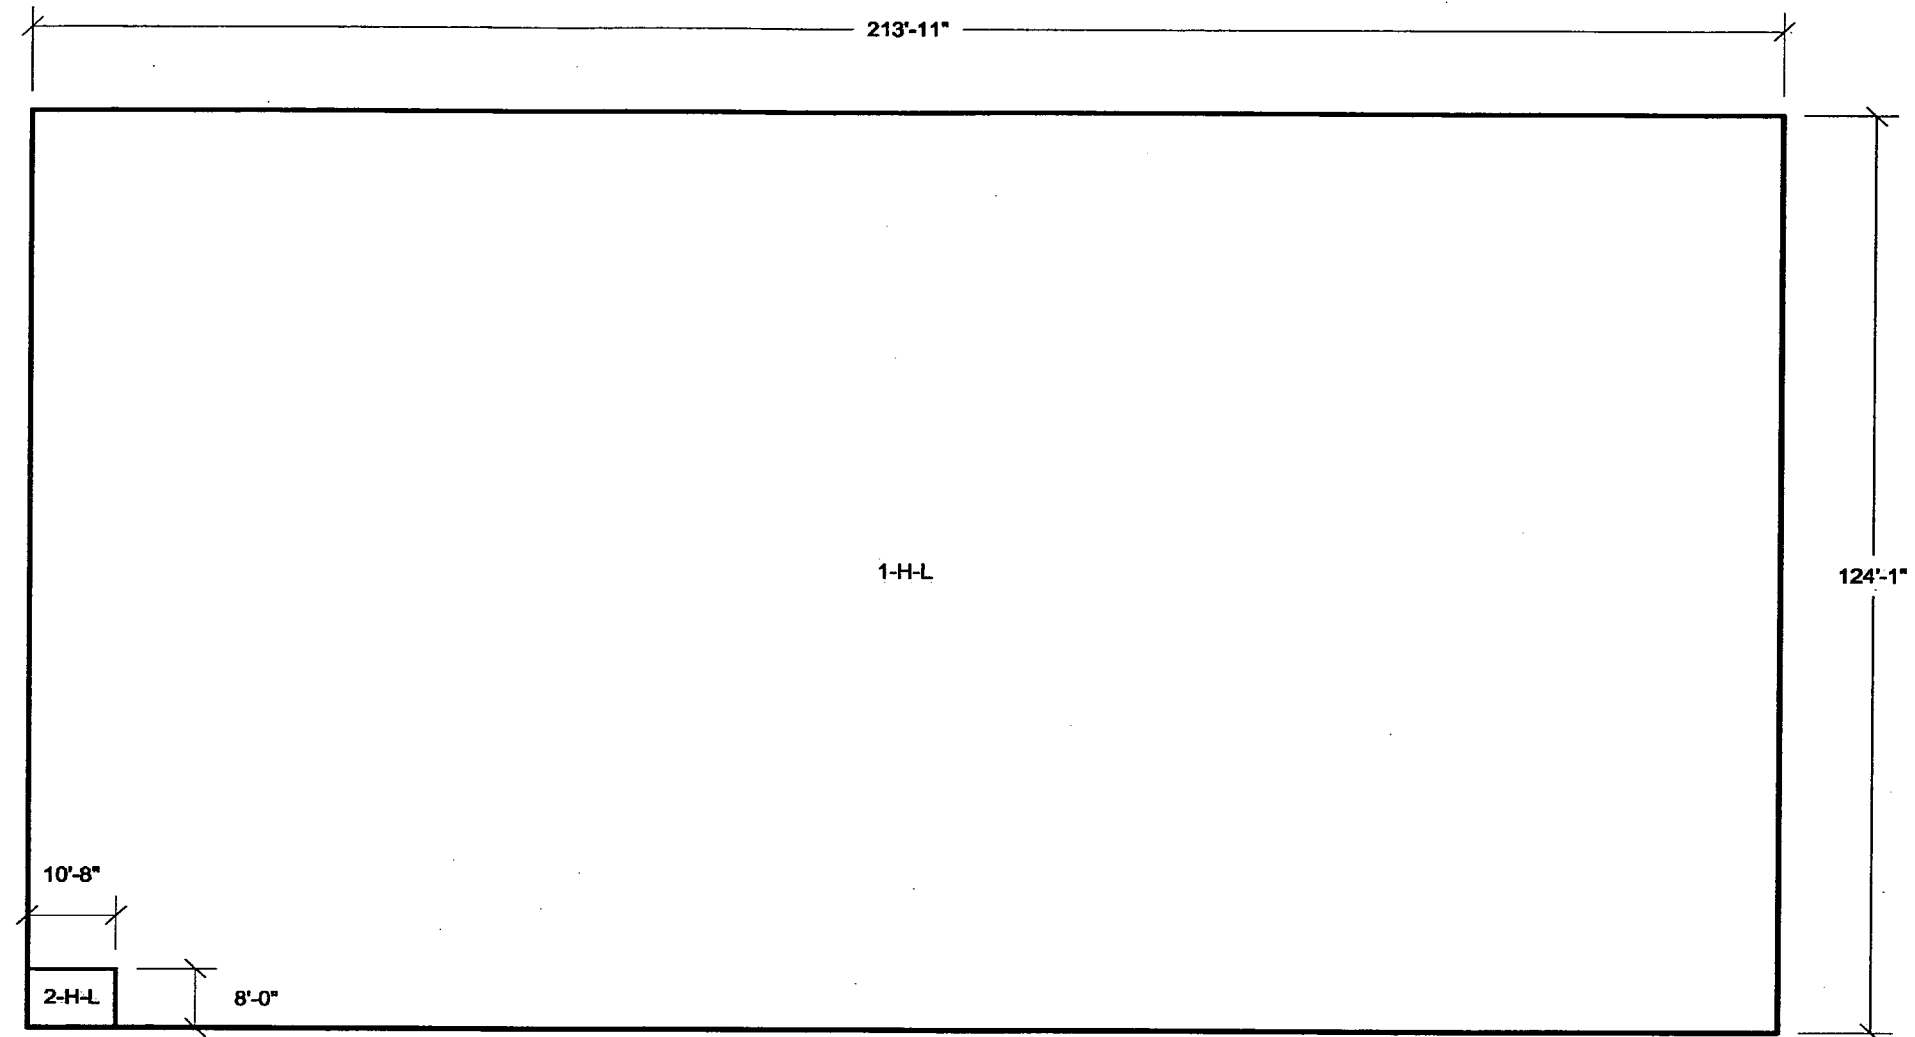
H.3-39: ELEVATION 95 LOOKING DOWN
